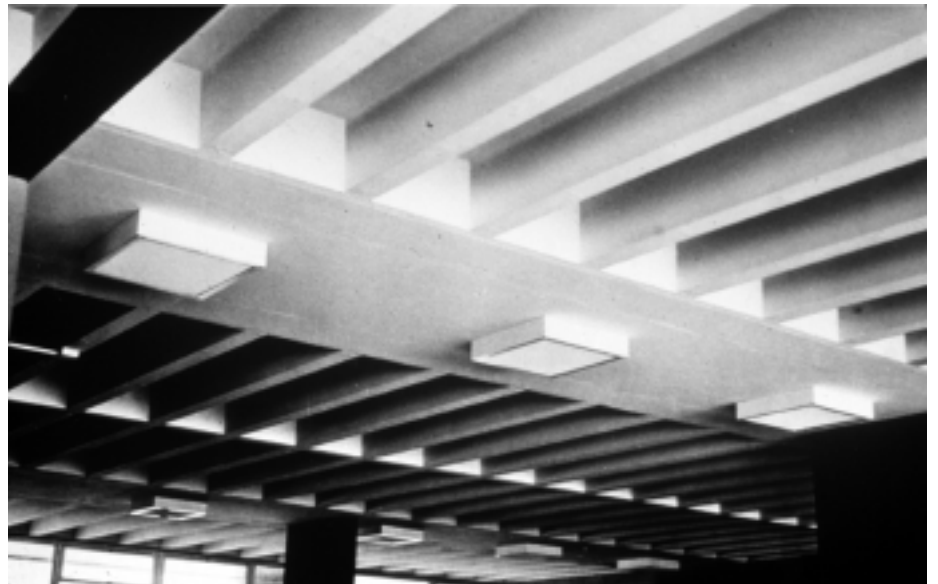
One-way joist floor system, with closely spaced ribs supported by monolithic concrete beams; transverse ribs provide for lateral distribution of localized loads. (Portland Cement Association.)
